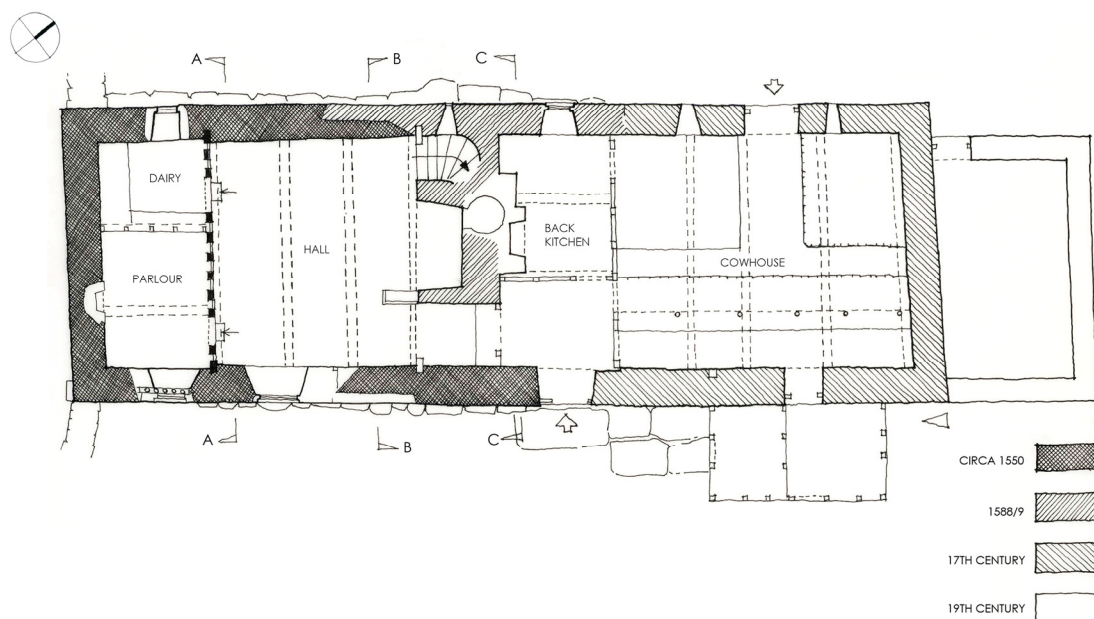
Plan of Llannerch y cawr, showing when alterations were made 1:200
